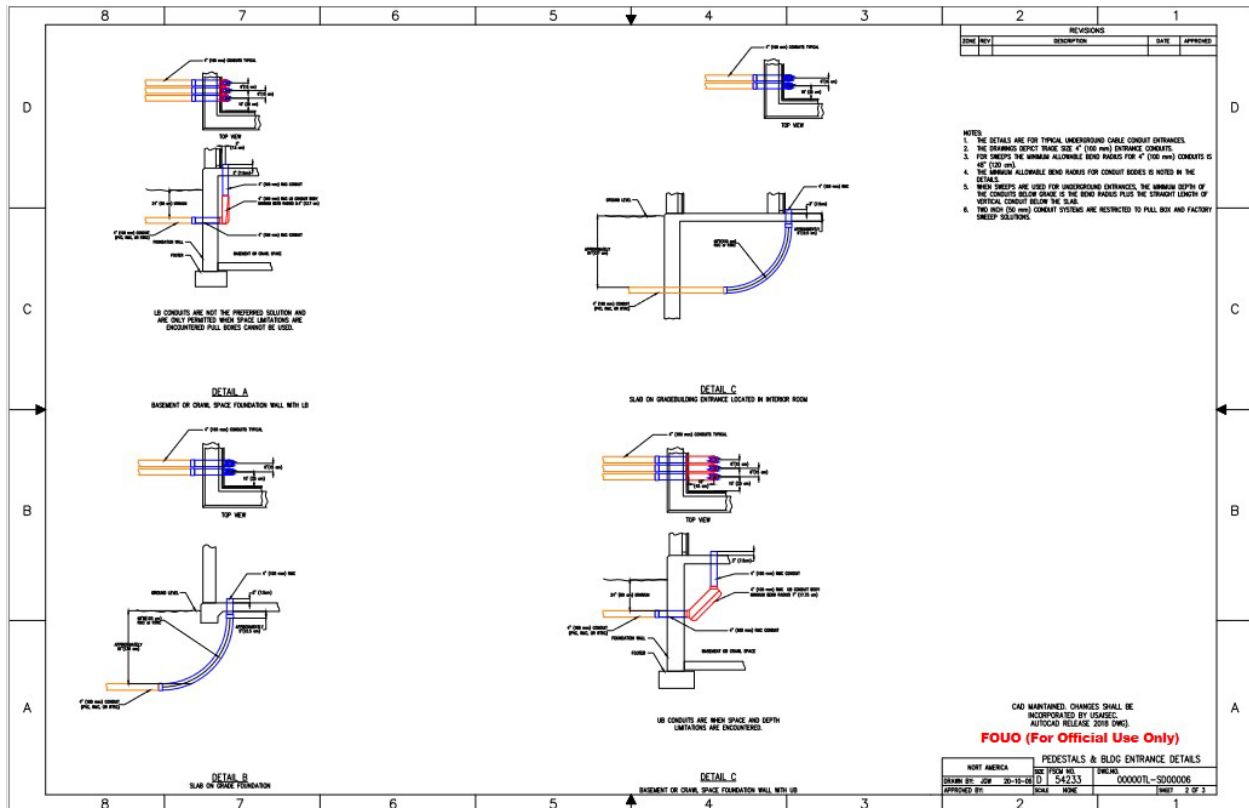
Pedestals and Building Entrance Details (Sheet 3 of 3)
